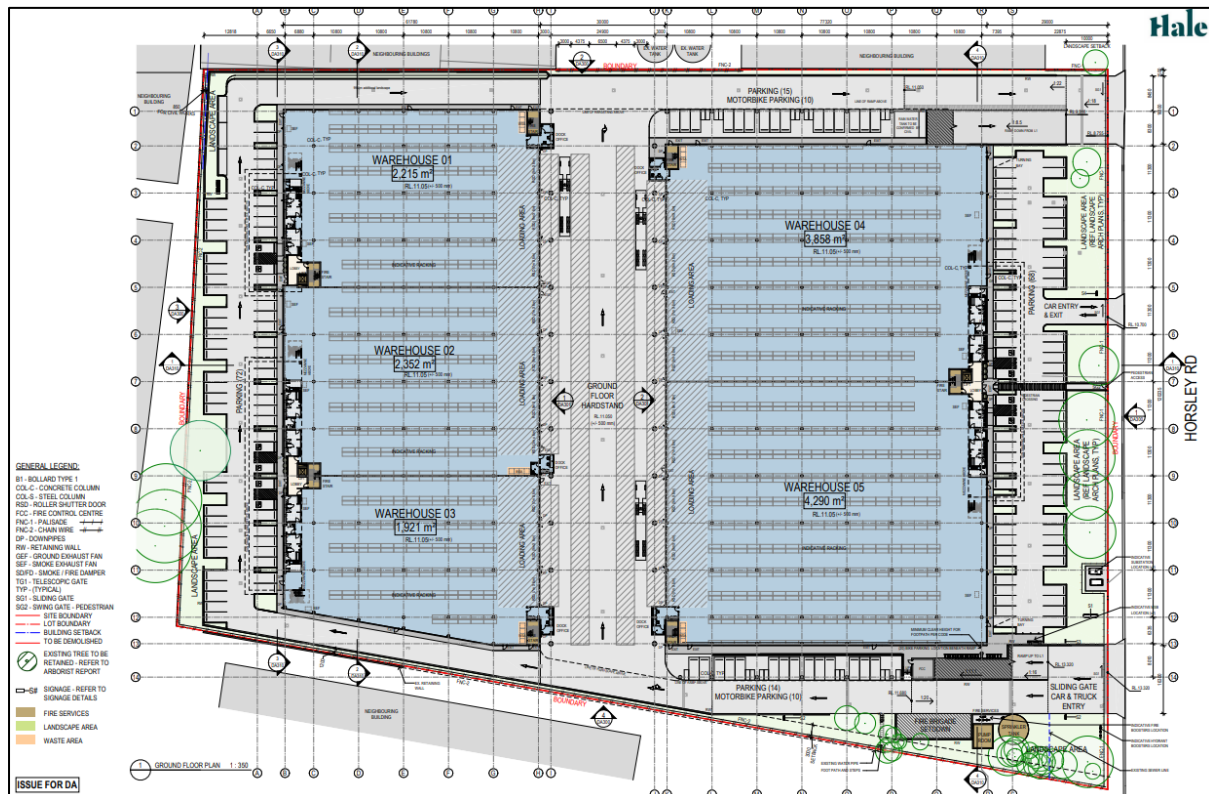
Updated Site Plan (Source: SBA Architects, March 2023)
